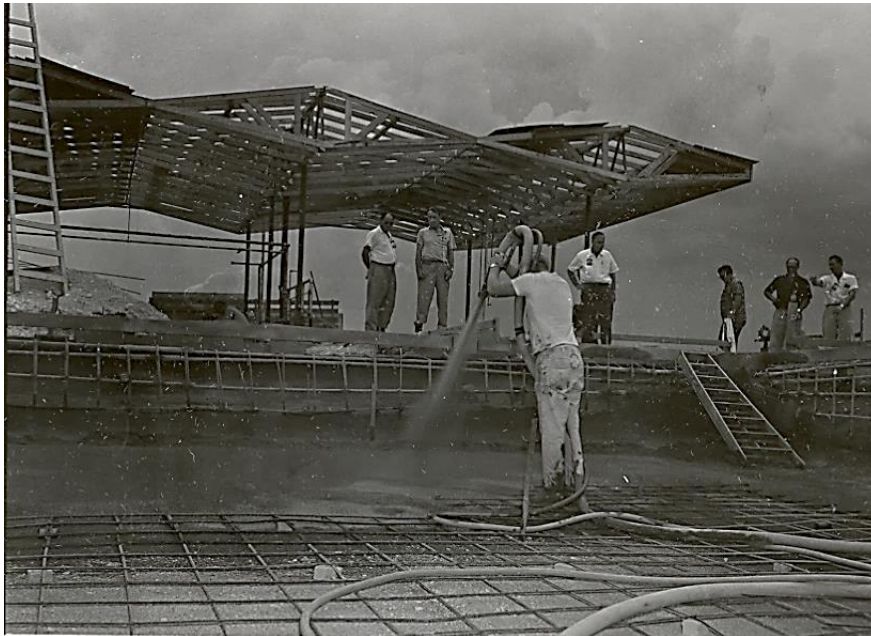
Pool House under construction. This photo illustrates the remarkable stability of the scissor-truss roof assembly and complete lack of load-bearing walls. It is identical to the Bowling Alley, other than its smaller scale and use of standard steel trusses to span each bent rather than glue-laminated beams (REECo Photo 1677-12, 1963-1964).
